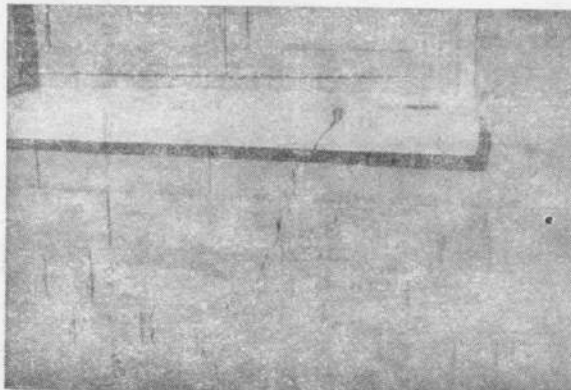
Cracks along mortar joints and window sill in S.D.M's Court at Pooh village.
